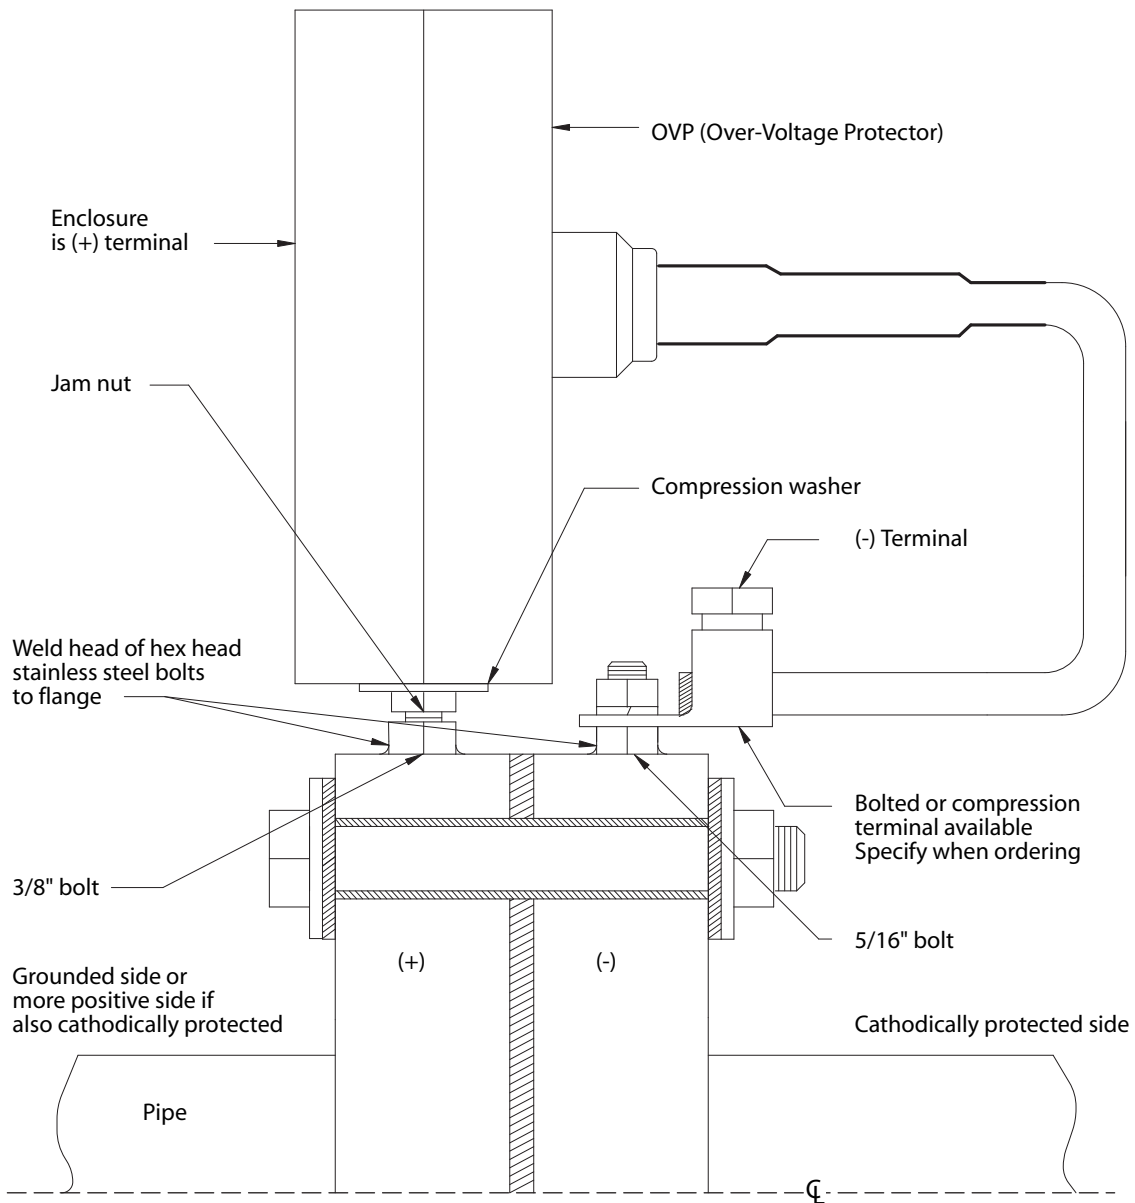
Insulated Joint Application – Flange Mount Using Tapped Holes
